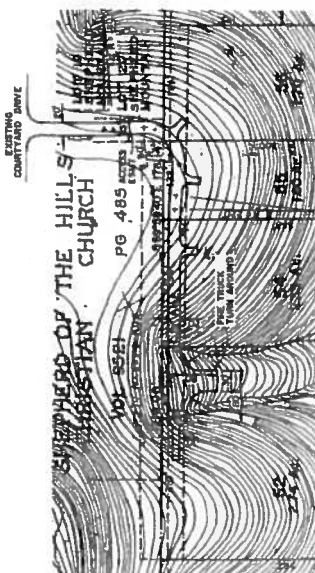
DETAIL "C" - TYPICAL DRIVEWAY PLAN
